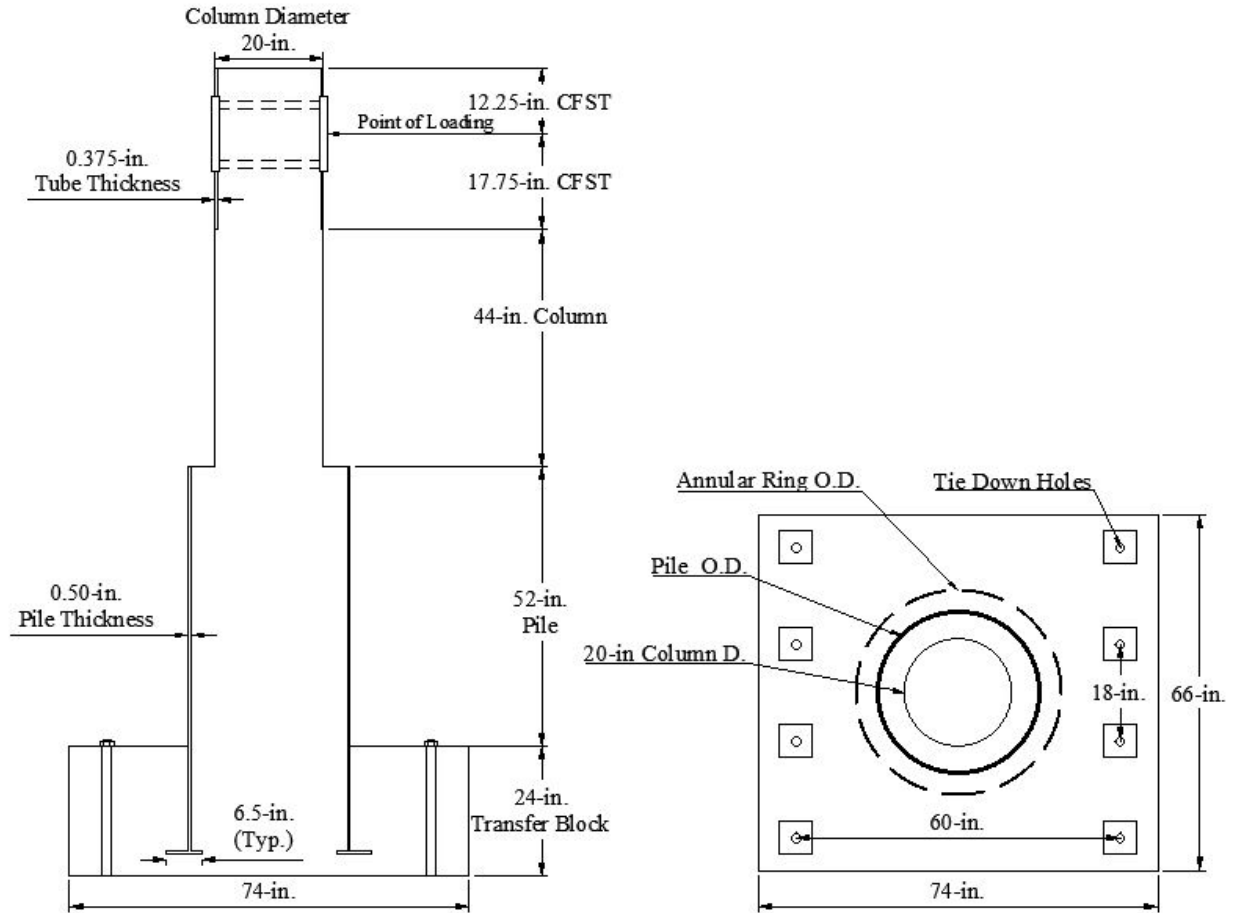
Specimen Layout and Dimensions a) Cross-section view b) Plan view
